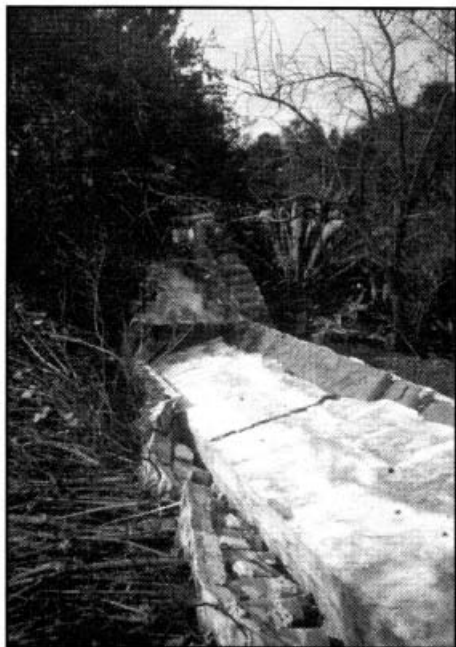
Overturning collapse of garden wall outside of the convento at Mission San Fernando ($S_L=5$).
